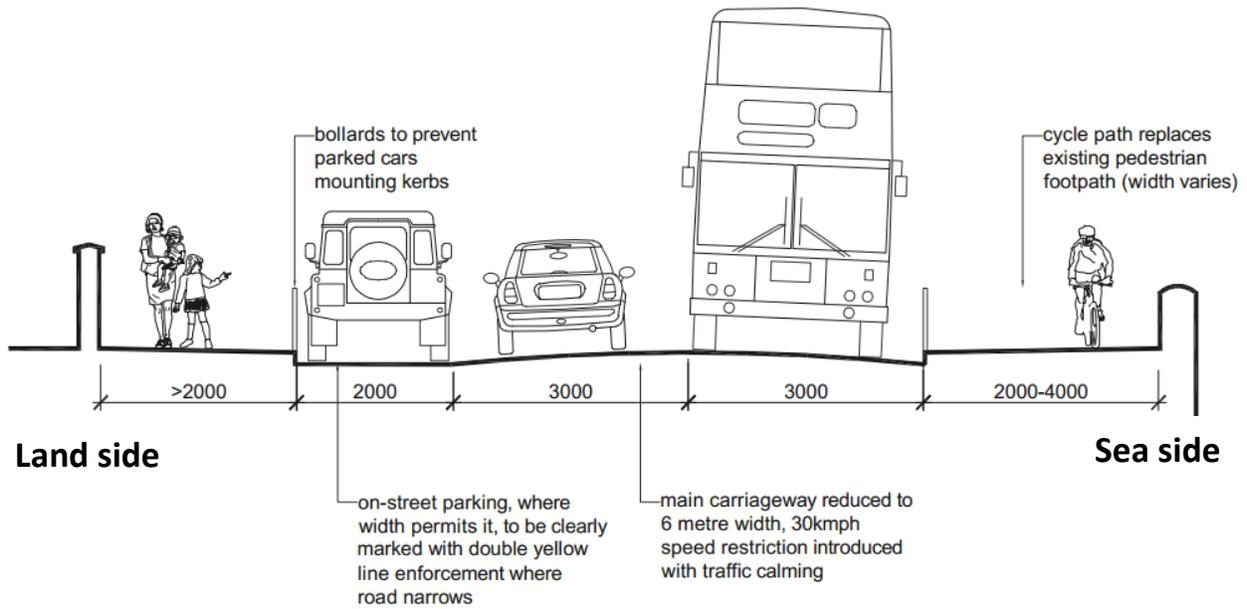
proposed section where existing width allows inclusion of parking zone – minimum width
